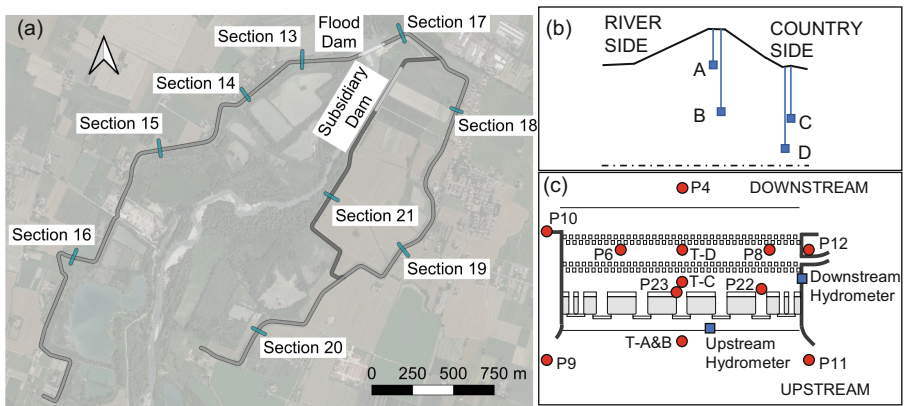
(a) Levees and flood dam layout; (b) Levee section with piezometers location; (c) Location of piezometers (dot) and hydrometers (square) at the flood dam.
